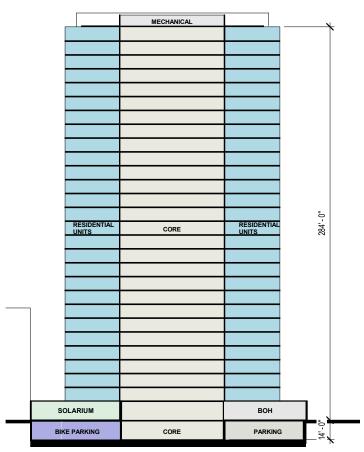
No Residential Parking - Tower Only Project Alternative Section
